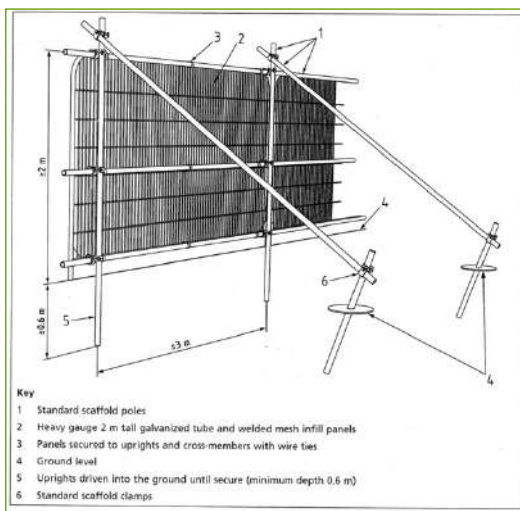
Shows the default specification of protective barriers (taken from BS 5837)
